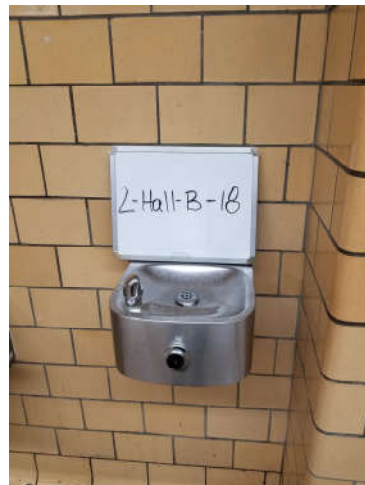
Bubbler, located on the 2nd floor next to room 208.
